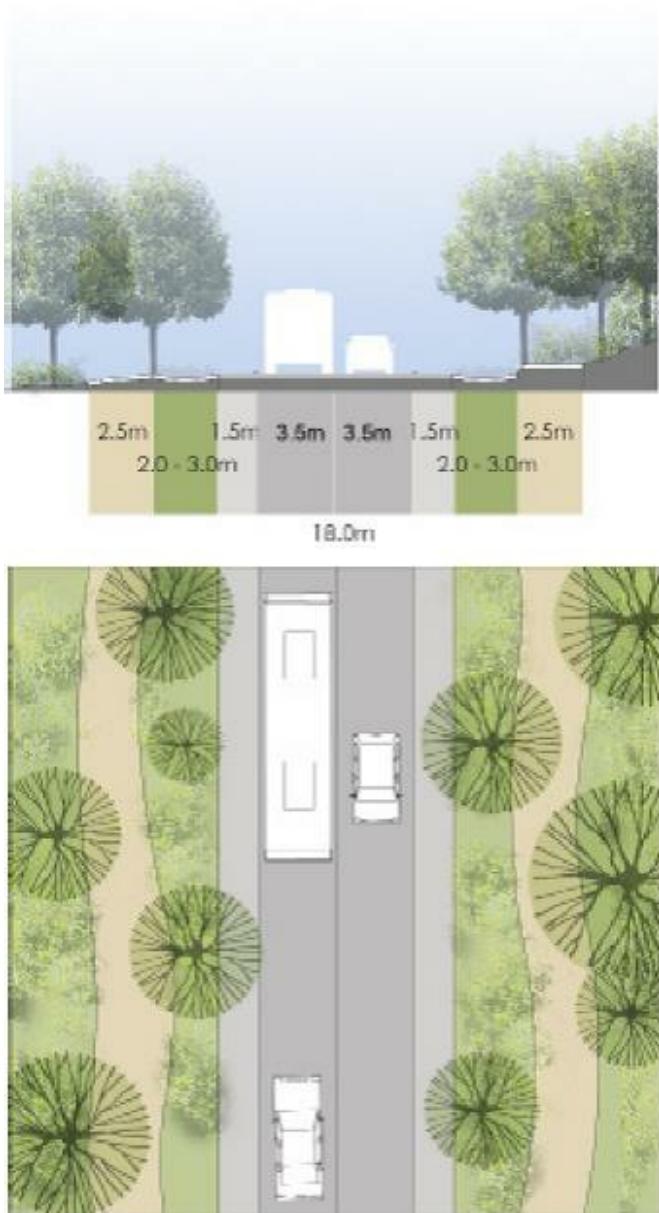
Western Link Road (Preserve) cross section and indicative plan
